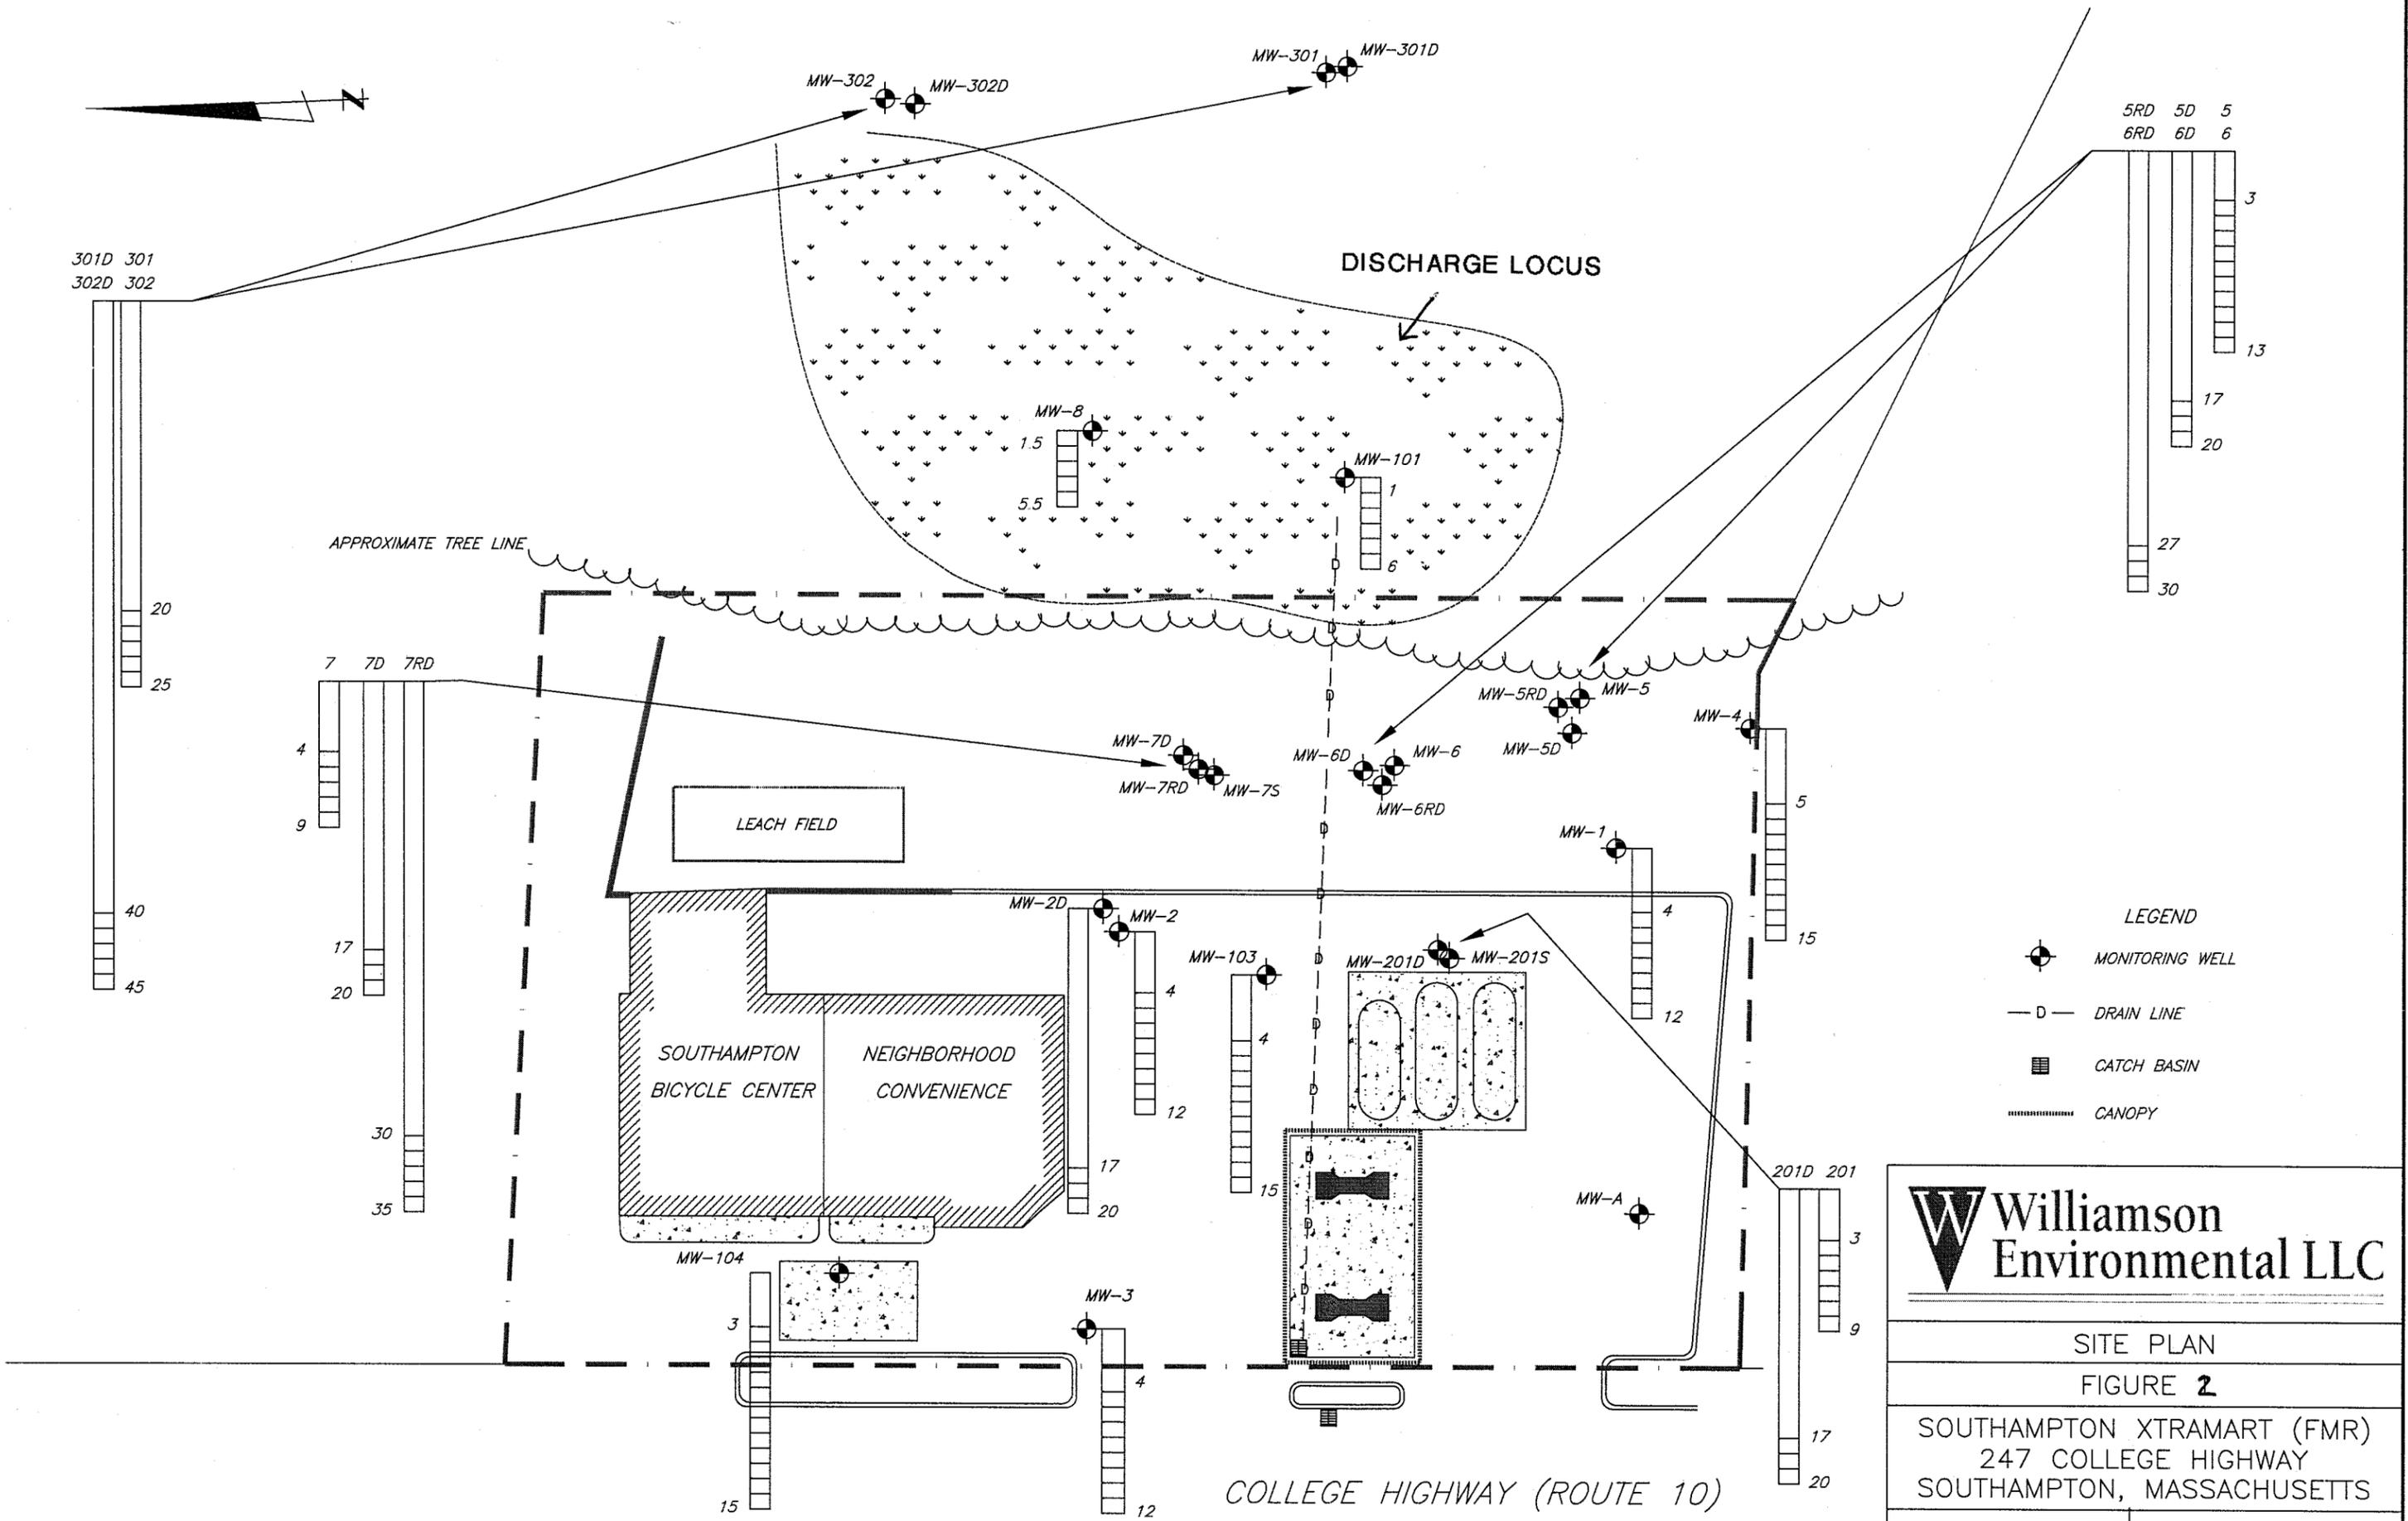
FIGURE CREATED FROM THE TOWN OF SOUTHAMPTON ASSESSOR PLAN 28.
